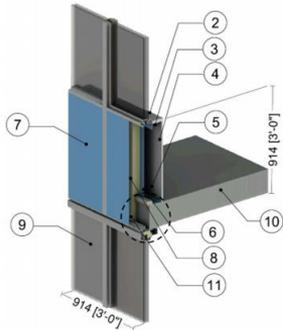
Window Wall System – Transition to Exterior Insulated Steel Stud Wall Assembly with Horizontal Z-girts (24" o.c.) Supporting Metal Cladding & No Interior Stud Cavity Insulation
